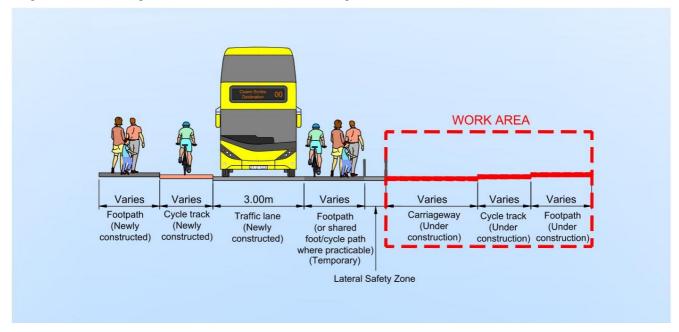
Traffic Management Cross Section, Section 5b – Stage 2
